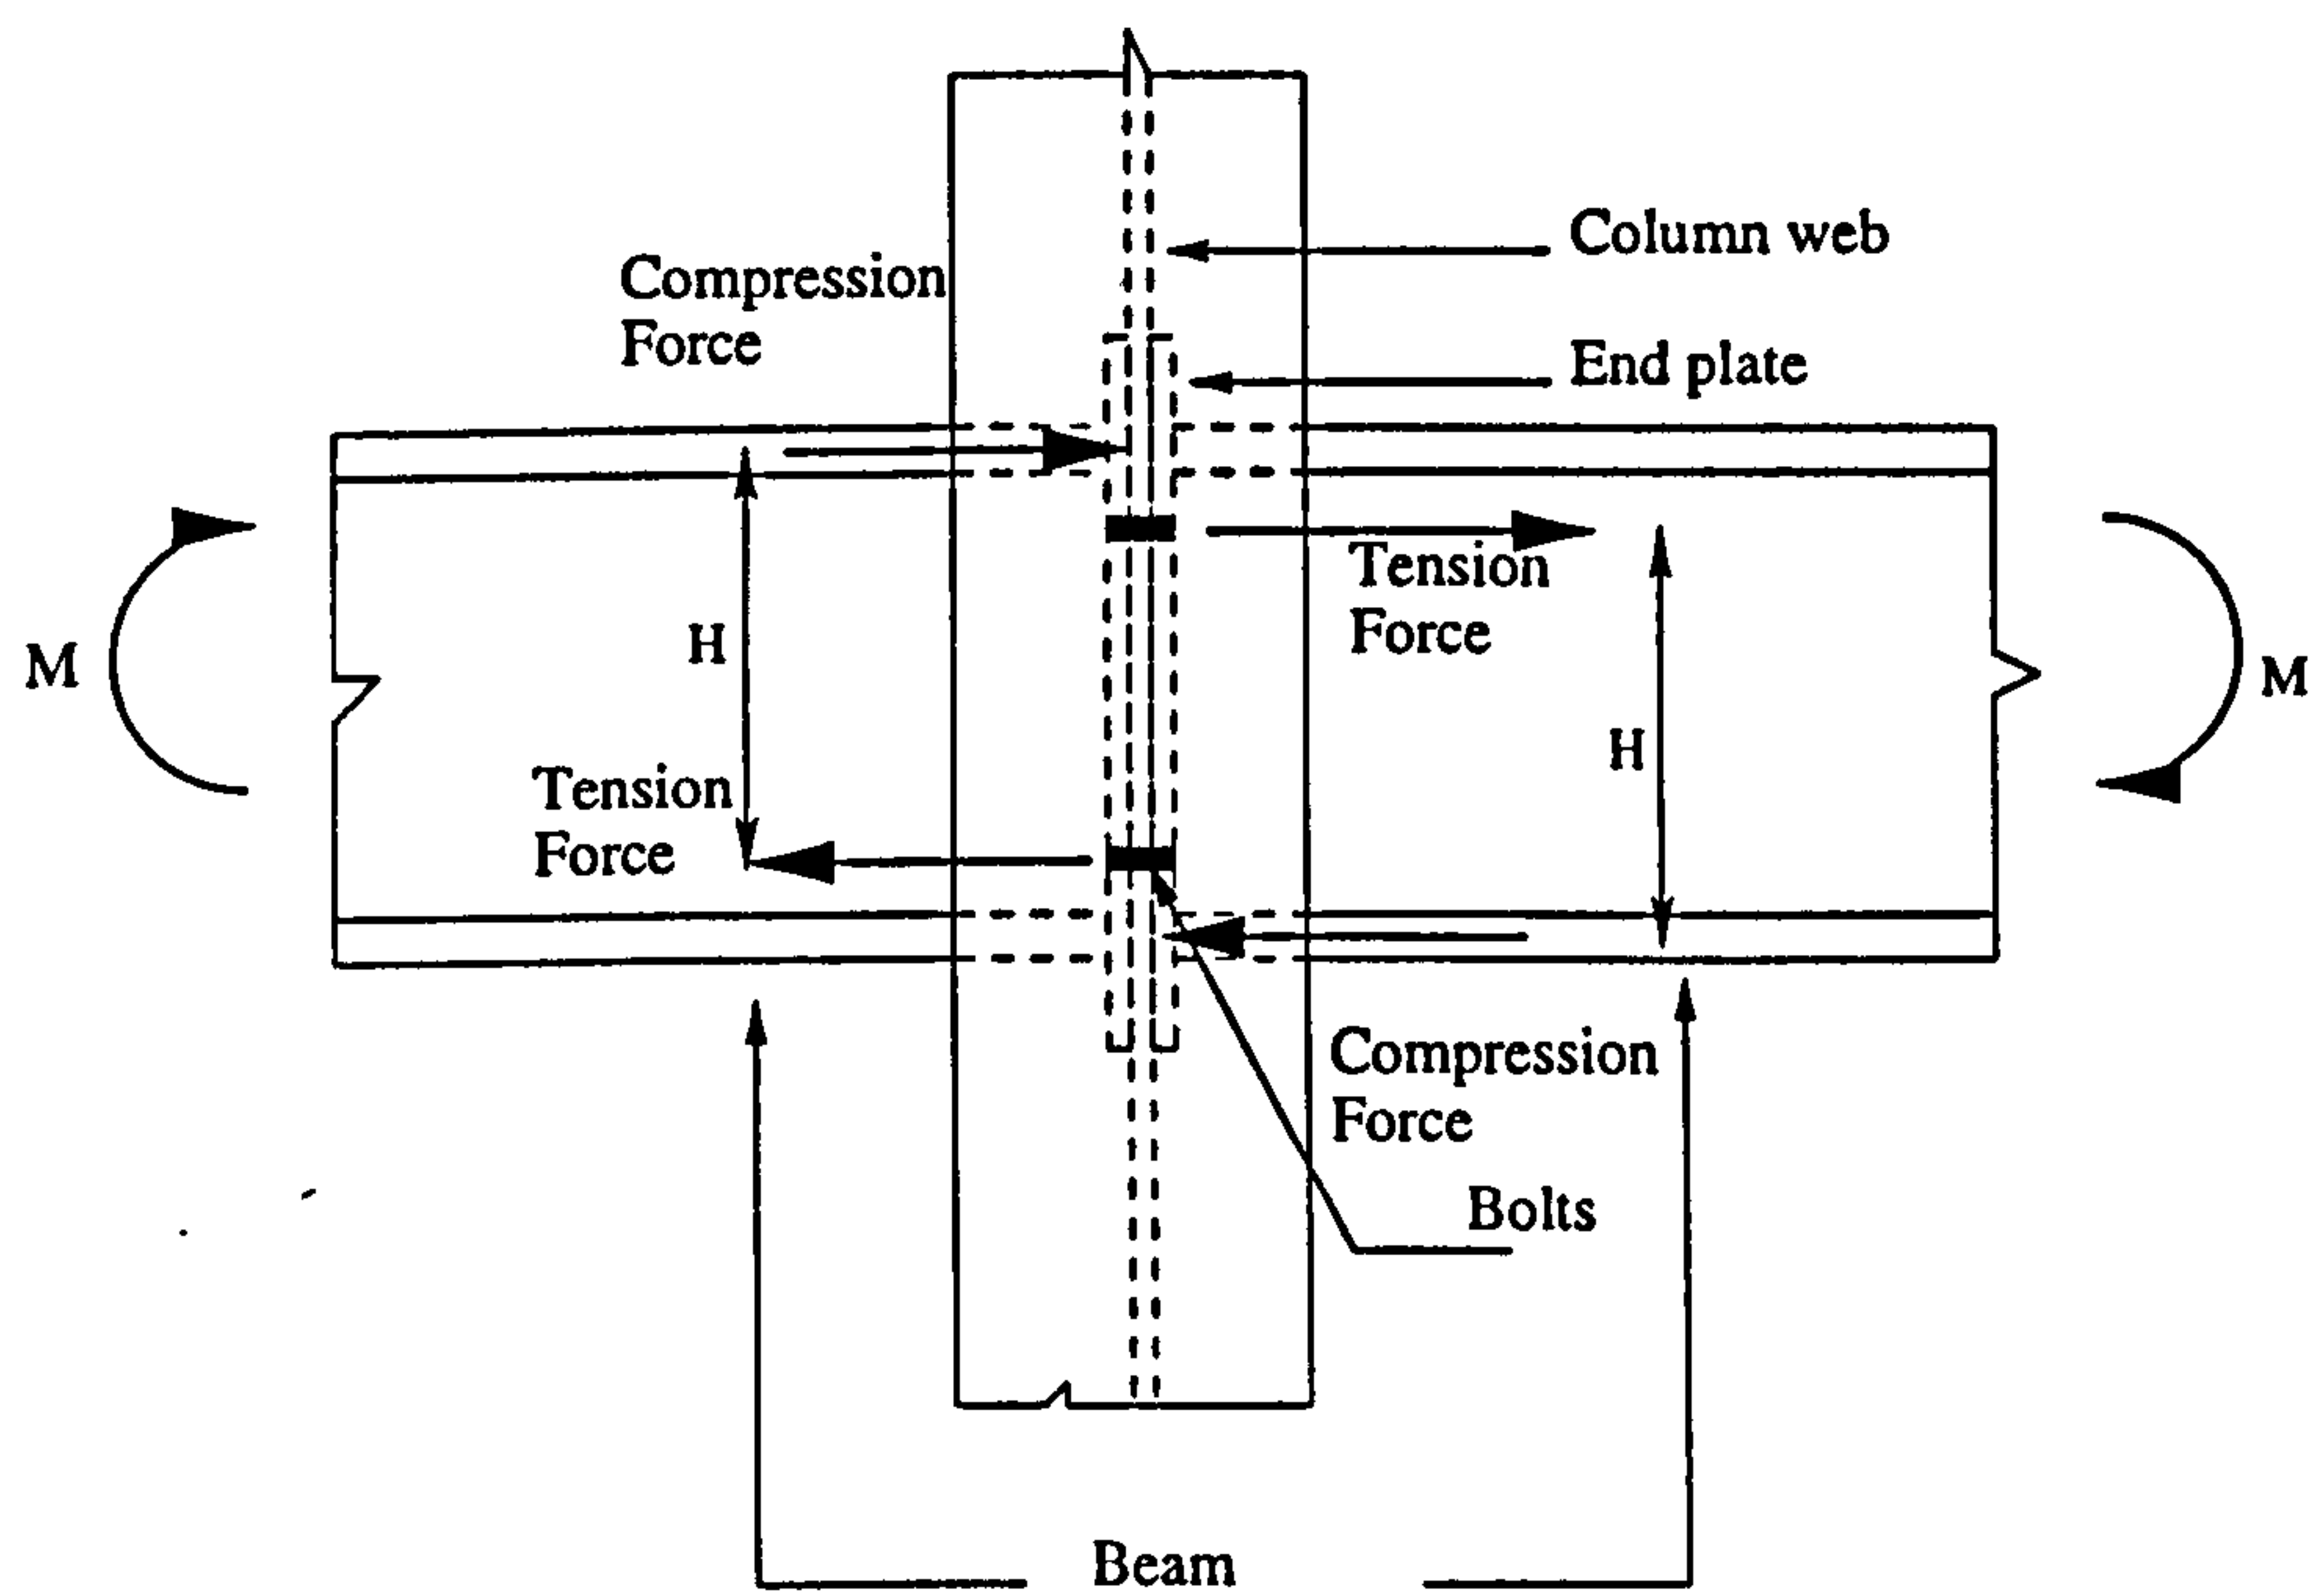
(b) : Flush end plate connection to minor axis for internal column
